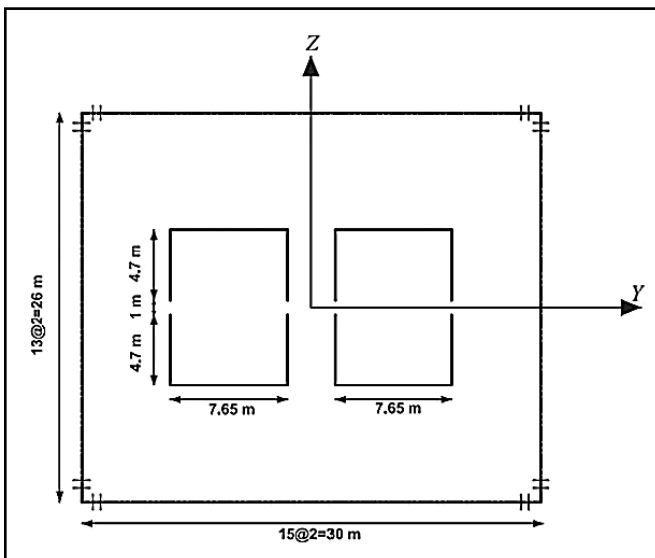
Plan of a 25-story tall building with a tube-in-tube system.
